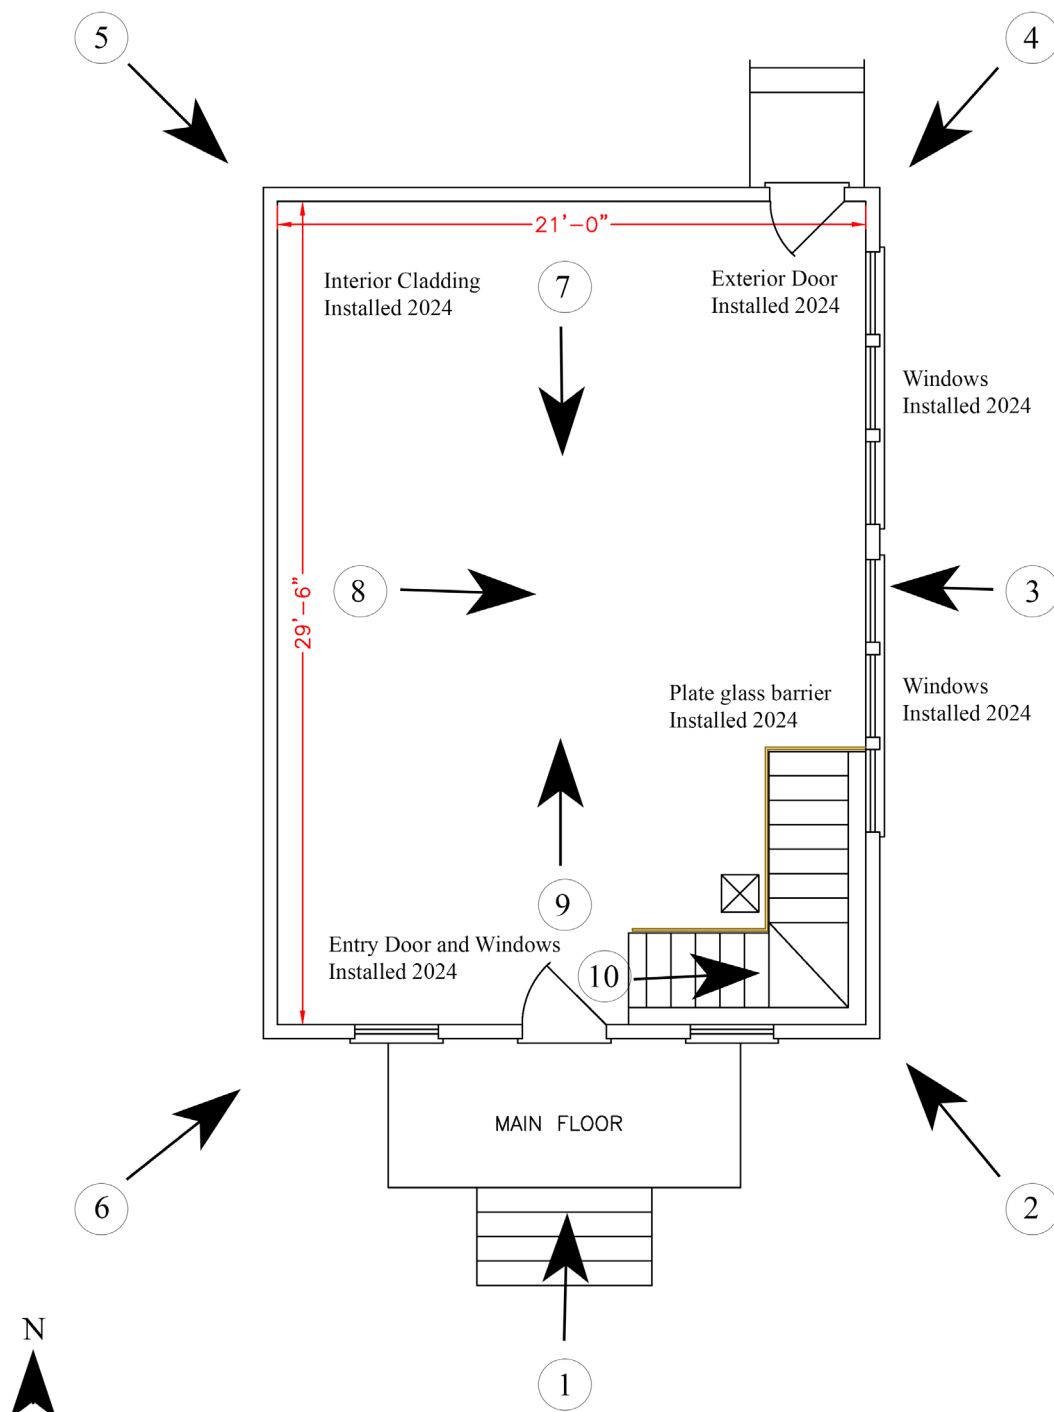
Current Floor Plan (Main Level). C.W. Oaks III.
